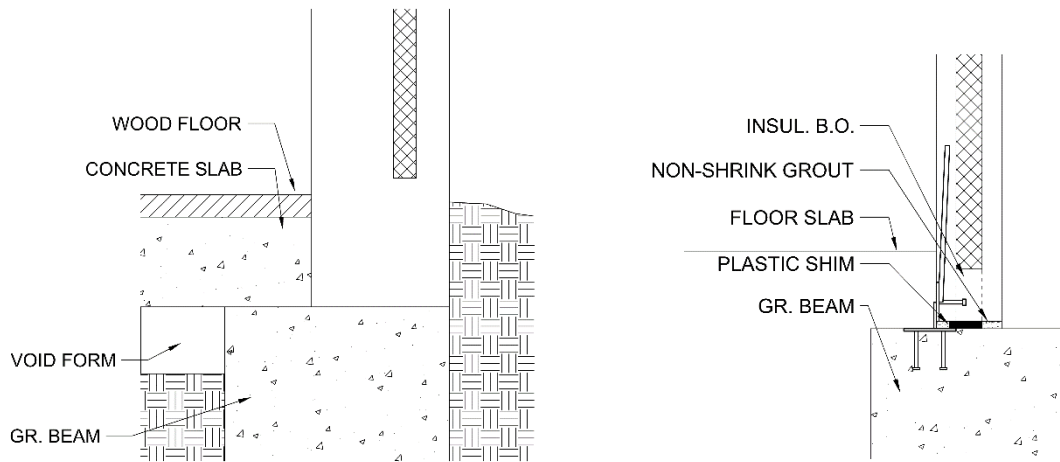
Sample foundation details with insulation almost or barely reaching ground surface
